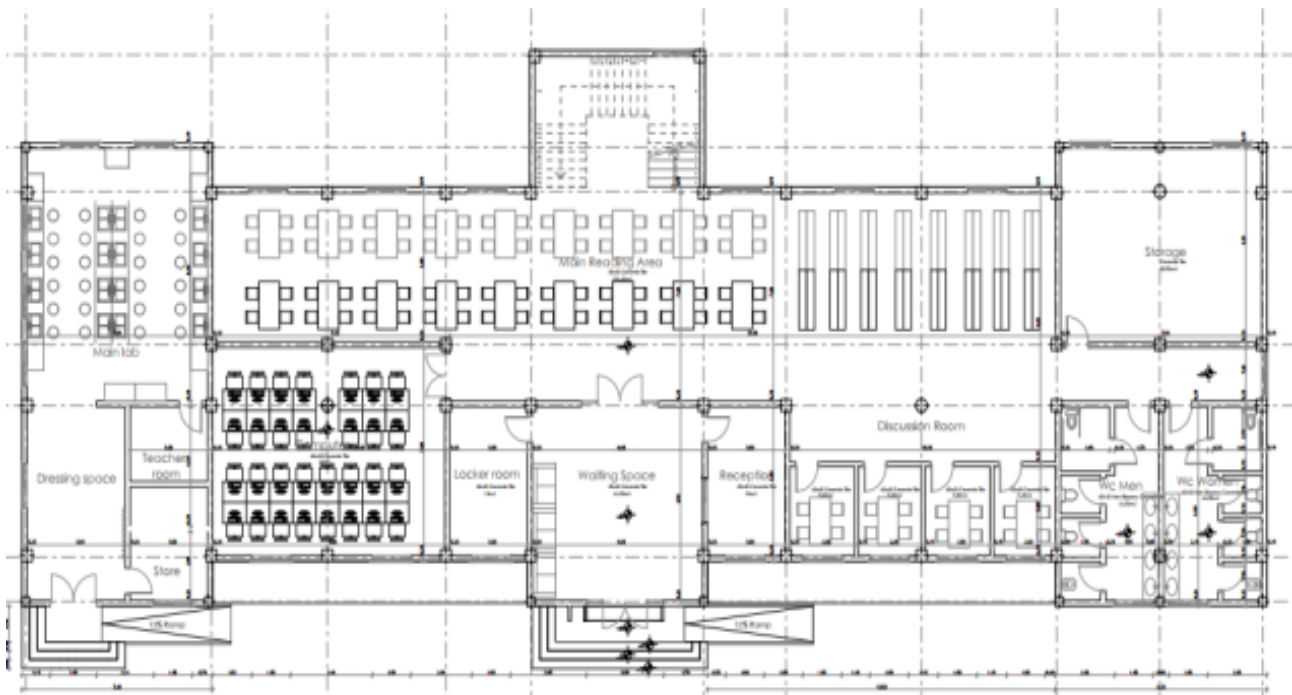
Lot 6 Floor Plan (Laboratory and Library)
